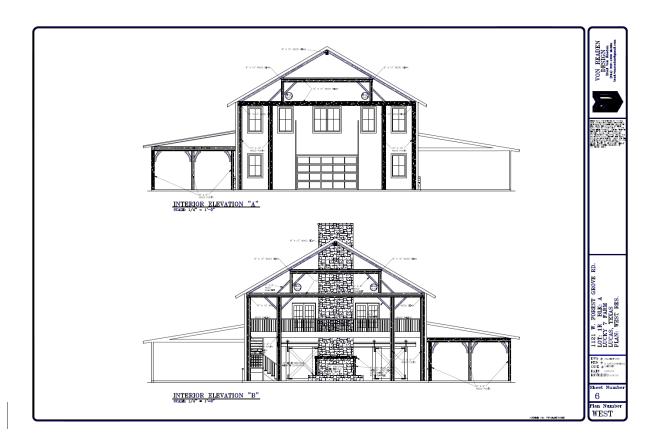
EXHIBIT "E" INTERIOR ELEVATIONS PLANS
